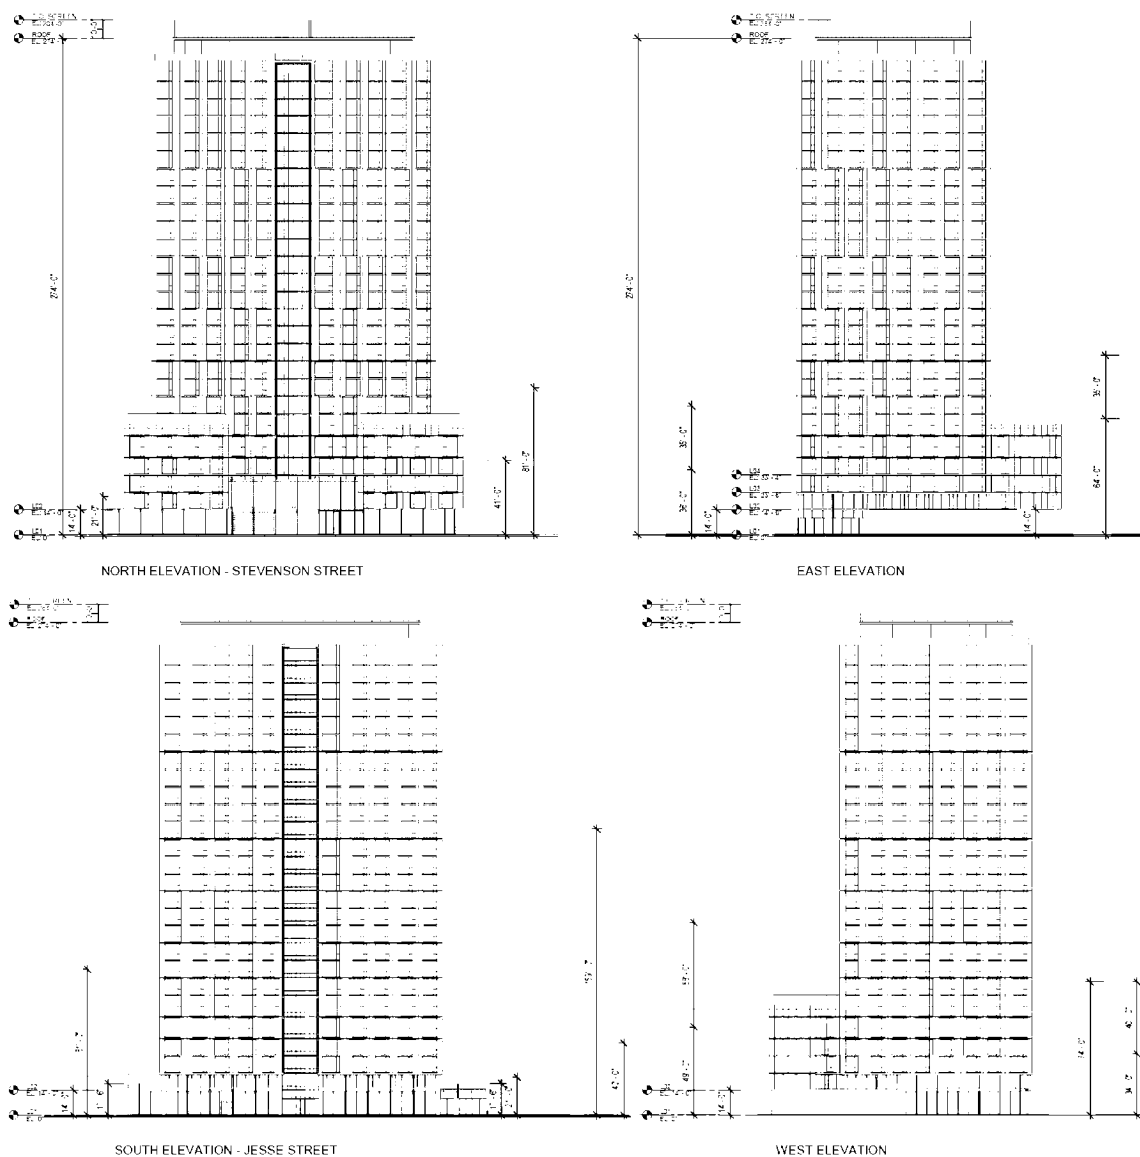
Proposed elevation drawings prepared by SCB, 2021.
